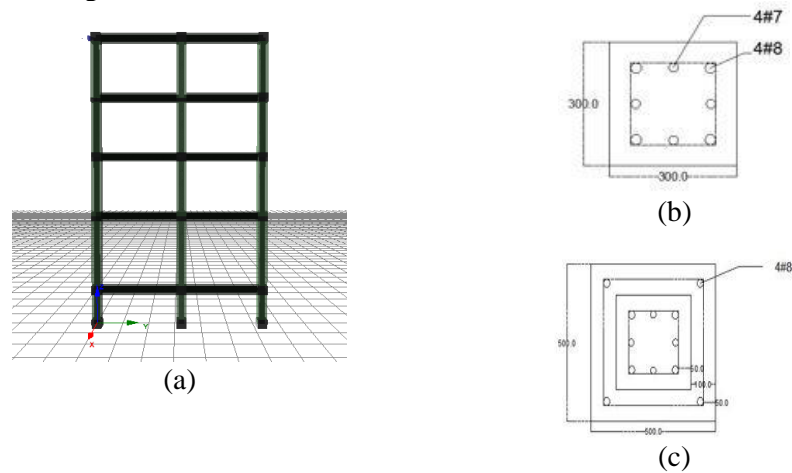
(a) Front elevation of the 2D building frame and (b) Typical concrete column cross section without retrofitting and (c) Column cross section with retrofitting.
